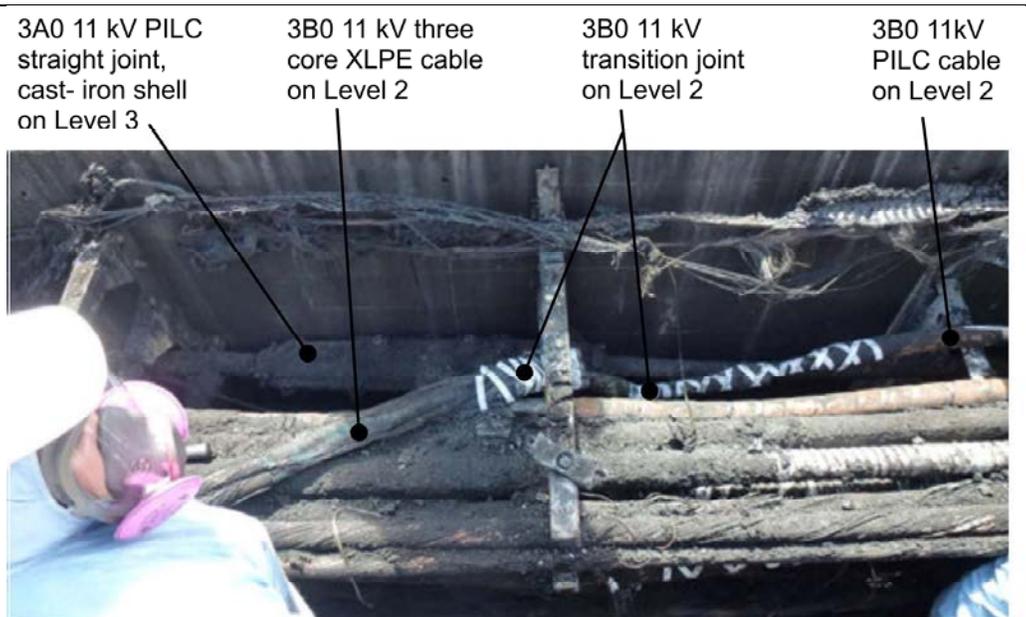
Level 1 cables removed. Revealed are a failed transition joint on Level 2 and a conventional cast iron straight joint on Level 3
